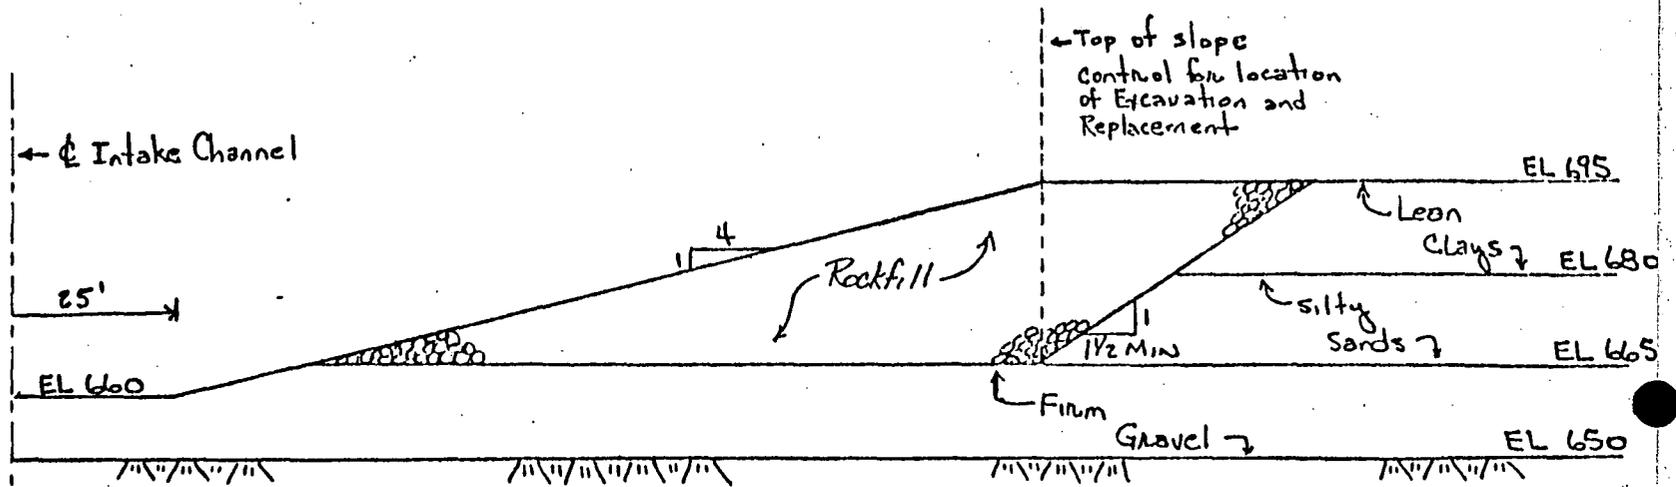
Intake Channel - Lateral Excavation and Replacement
